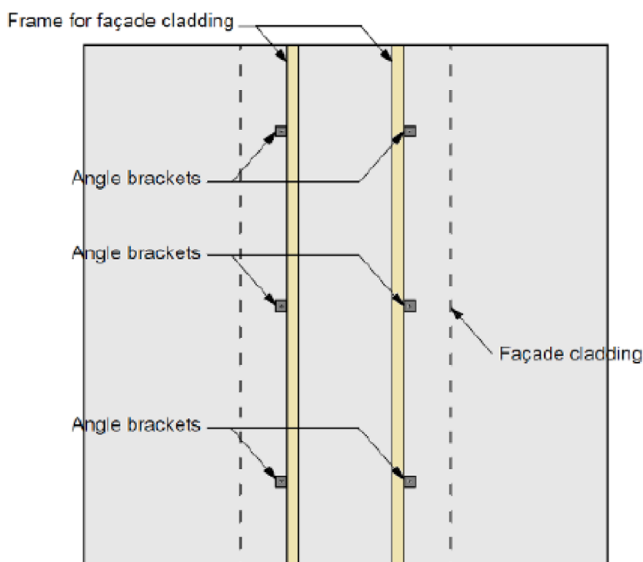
Example of statically indeterminate fixing for the anchorage of façade claddings
